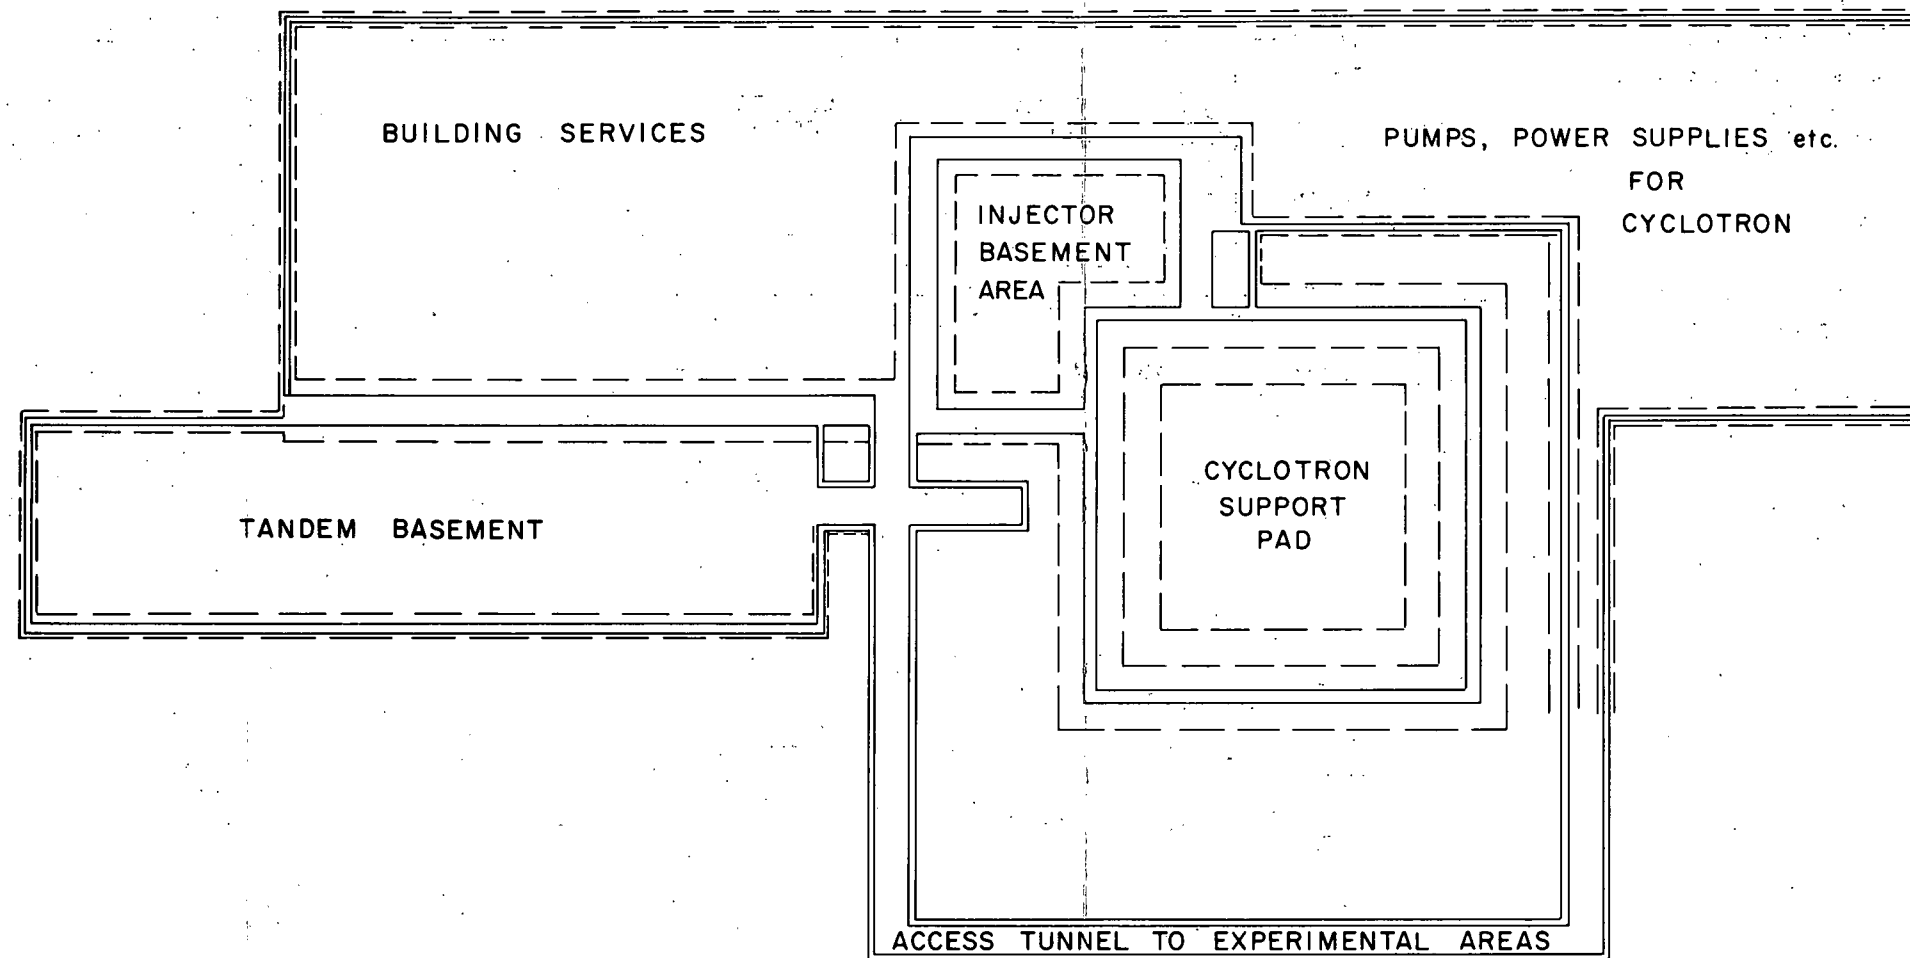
Plan of the basement areas. The dotted lines indicate foundations for major walls and heavy components such as the cyclotron. The U-shaped tunnel connects the experimental areas with the basement of the control and service building, giving access for services, signal cables for experiments, and experimenters.
